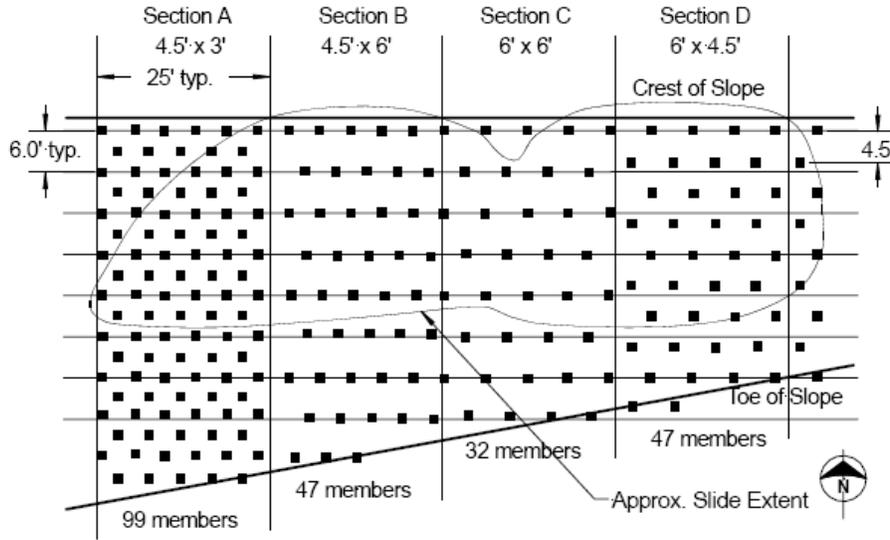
Plan view of selected stabilization schemes for slide area S3 at the I-70 Emma test site (Loehr and Bowders, 2007).
